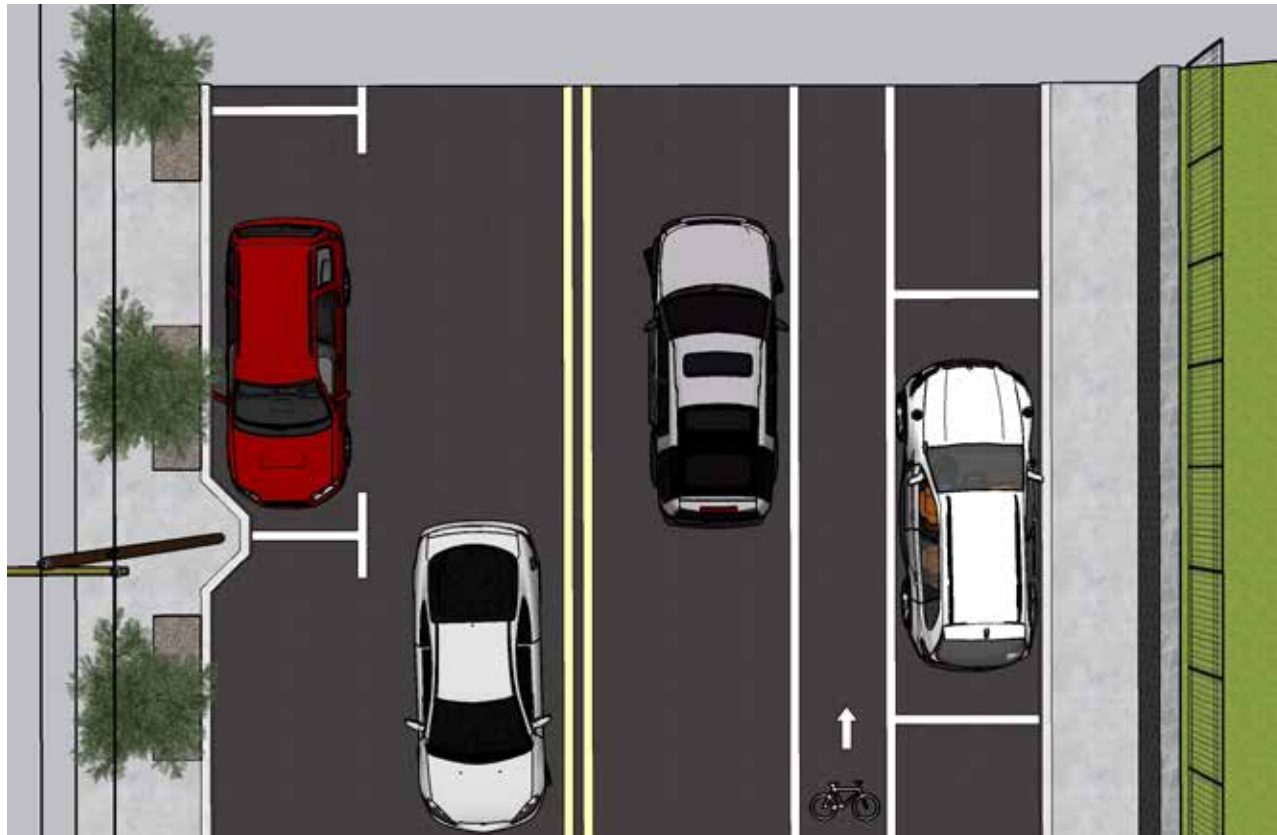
Albany Street : Georgetta Dix Plaza to Germania Avenue Design Concept Plan
